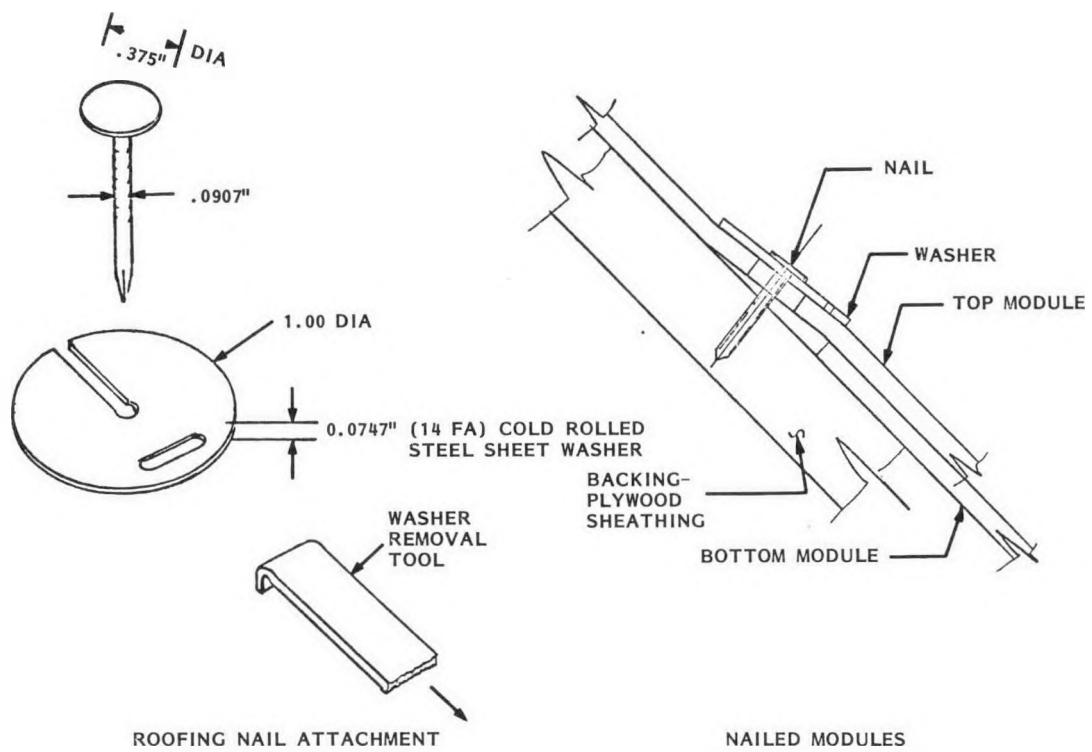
Roofing Nail Attachment of the Block IVA Shingle Module
